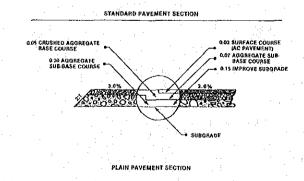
STANDARD CROSS-SECT. OF ASPHALT PAVEMENT
